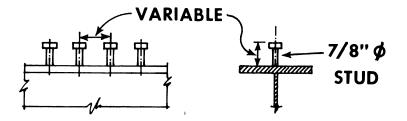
Shear connector details for continuous steel girder utilizing prestressed subdeck panels.
